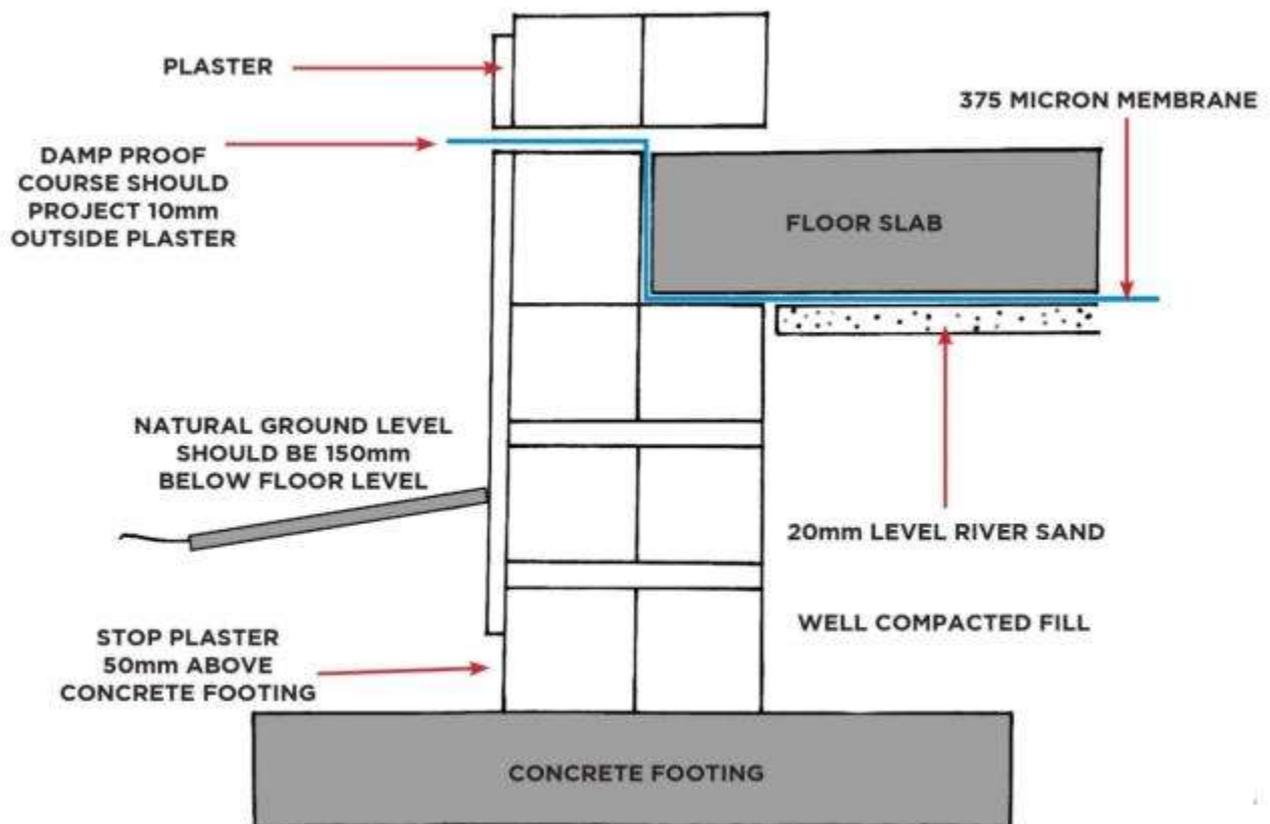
DETAIL OF DAMP PROOF COURSE AND PLASTER TO HELP WATERPROOF HOME FOUNDATIONS AND PREVENT RISING DAMP (ADAPTED FROM *THE PROUD HOME OWNER* BY ALBERT VAN WYK)
